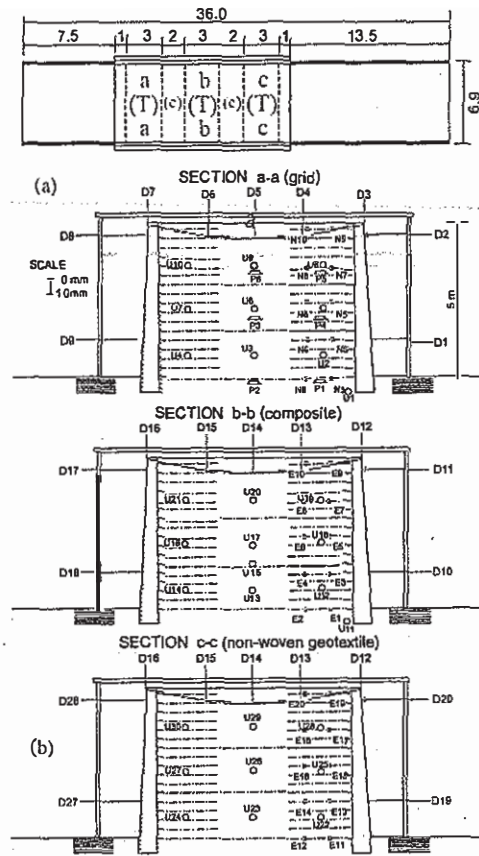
(a) Plan and (b) three sections of JR No.2 embankment (clay) (T; test section, and C; control section)
